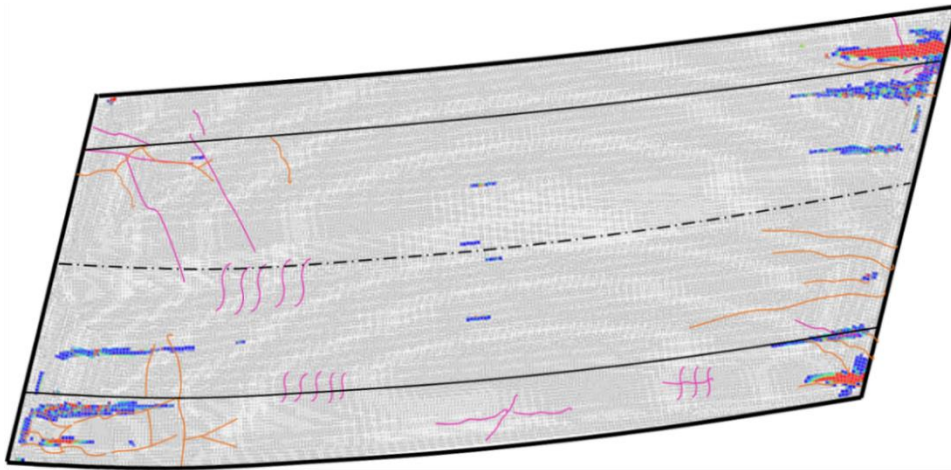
Observed and computed cracks on SR299 bridge deck (Span 1).
